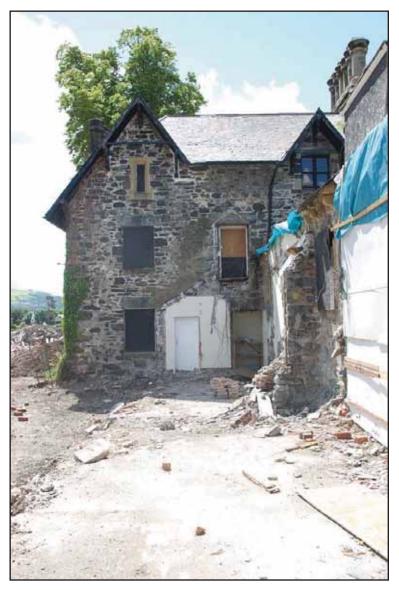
Headmaster's Building - north elevation east side. Note the former building extension which was demolished in 2008 and the first floor window converted into a door. Scale: 1.0m
